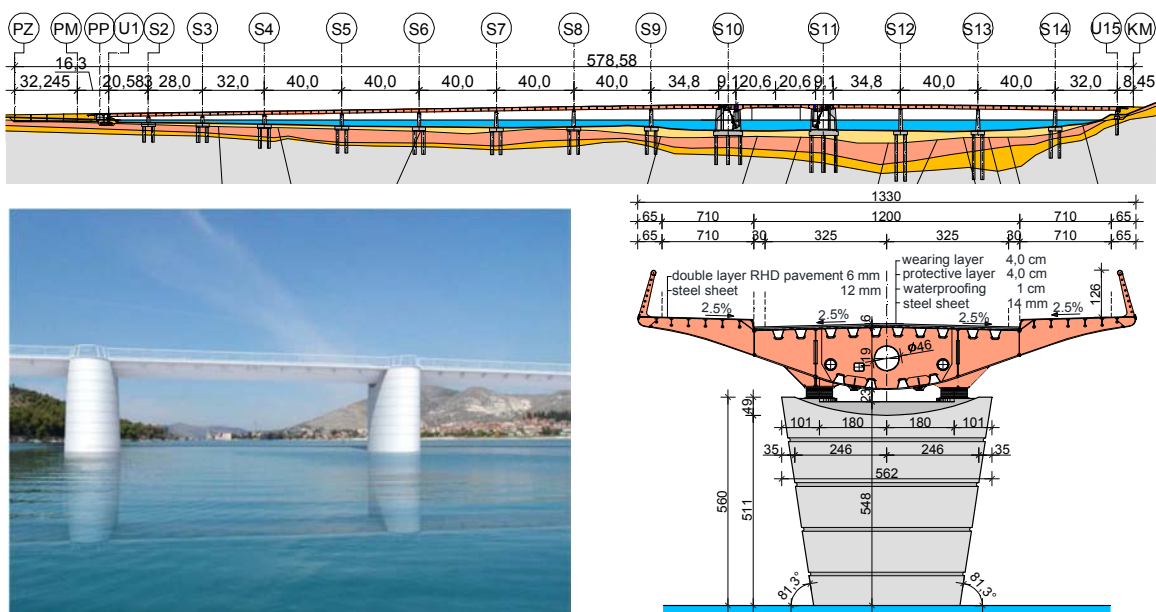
Trogir – Čiovo Bridge: longitudinal layout, computer rendering showing spaciousness of the bridge enabling a good view of the old town and cross section at immovable parts of the bridge
